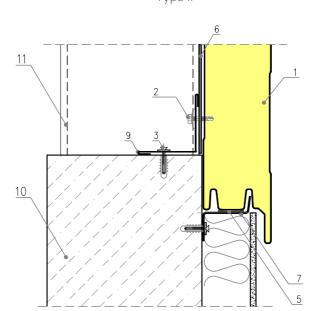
IzoGold PIR/PIR+ - horizontal configuration, ground beam joint
